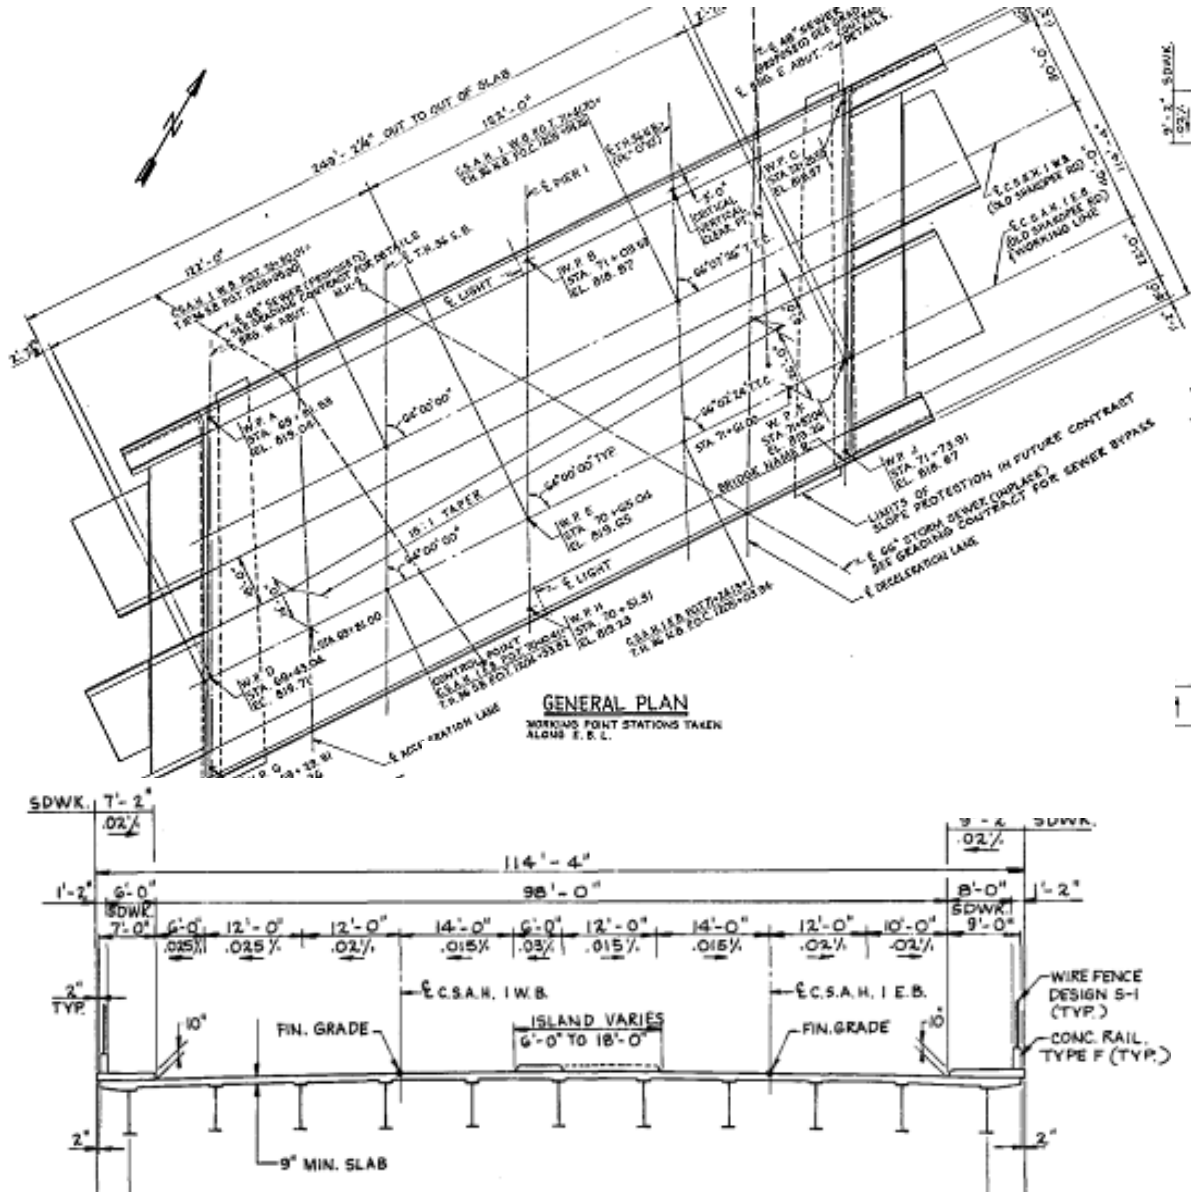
Plan view (above) and cross section (below), bridge 27062.
